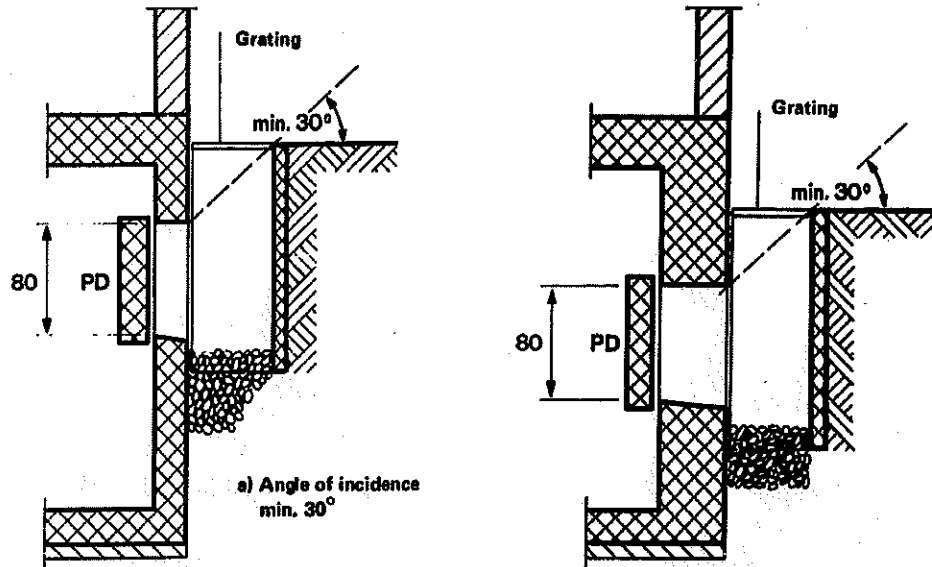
Arrangement of emergency escape-shaft with light opening.
